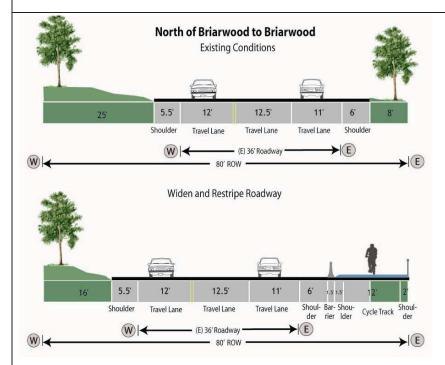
Conceptual Section 3.1b4- Widen Trail 8' (E), Widen Roadway 9' (W), Restripe for 195'
